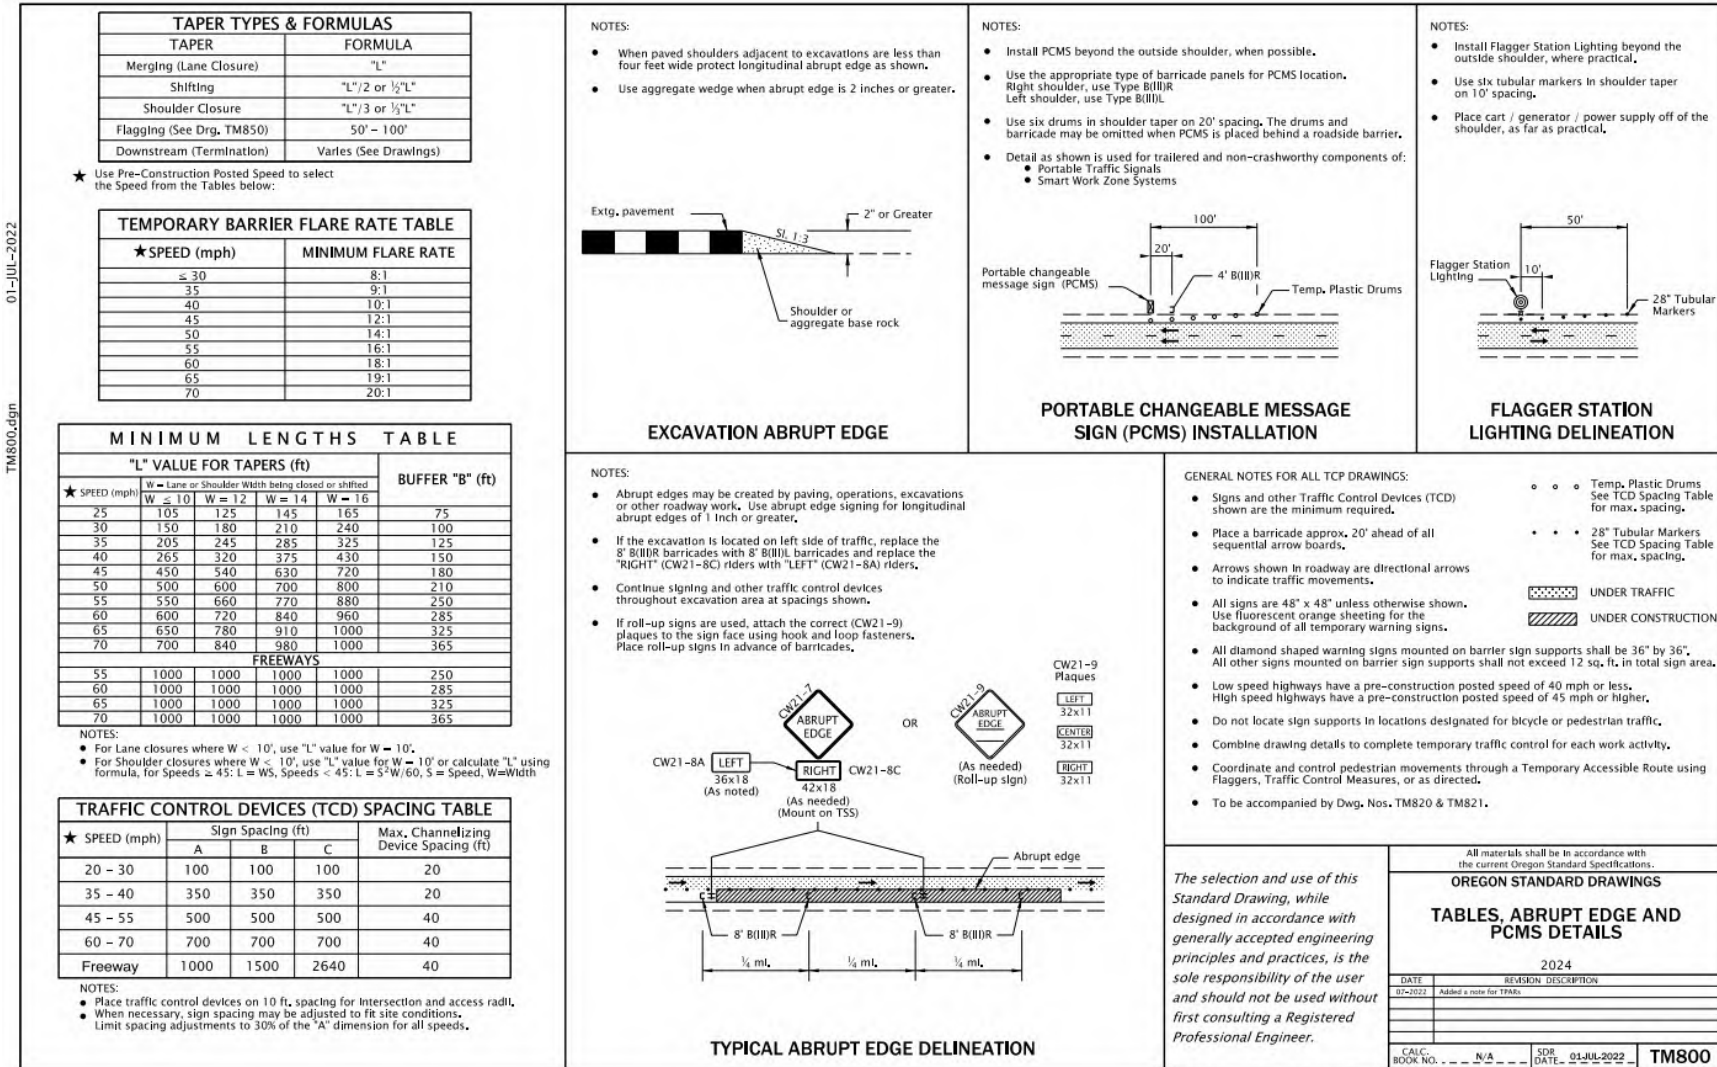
Example ODOT Traffic Control Plan. Tables, Abrupt Edge and PCMS Details.
